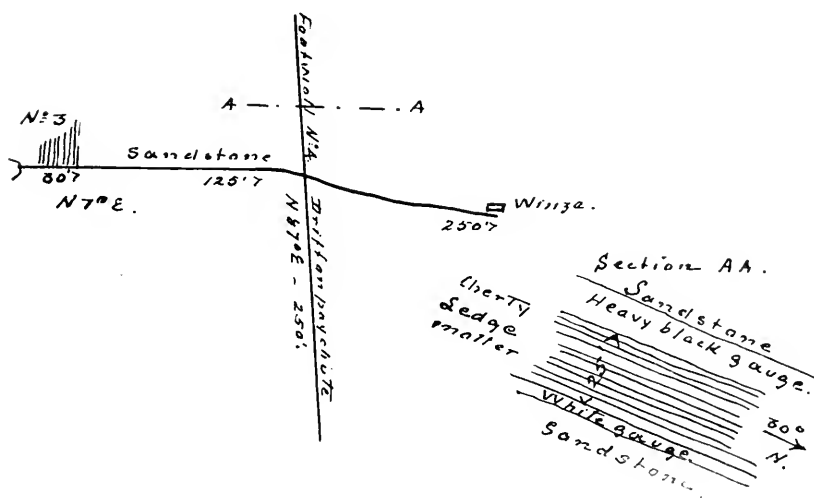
Cloverdale Mine—Plan and section of Murphy tunnel.
